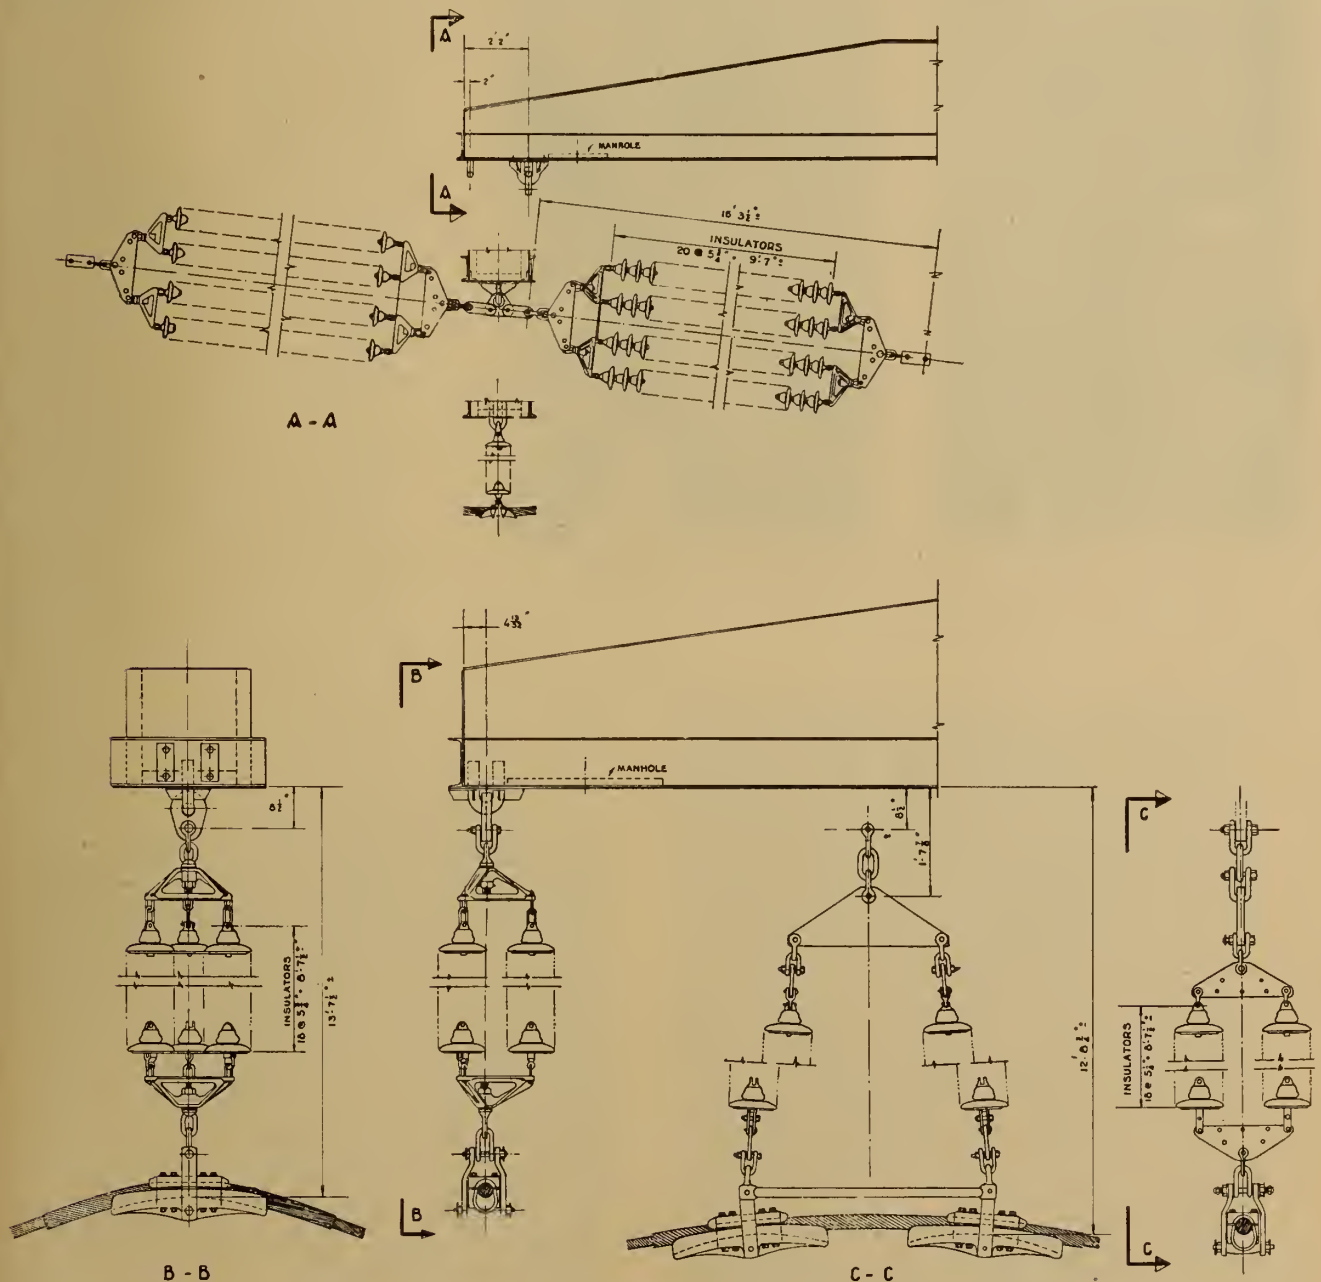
A-A Insulator assembly for angle-strain towers. B-B Triple-string insulator assembly for suspension tower. C-C Double-string insulator assembly for suspension tower.
